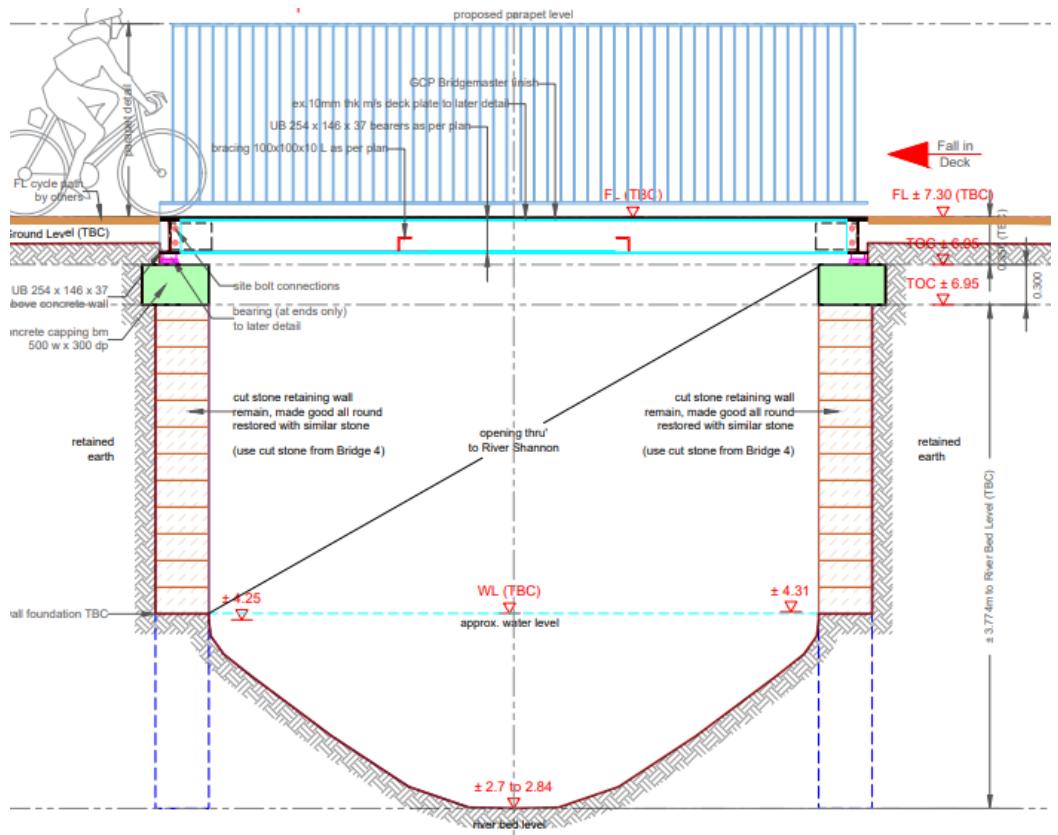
Proposed deck replacement for Bridge 3 with new concrete plinths on existing stone abutments
